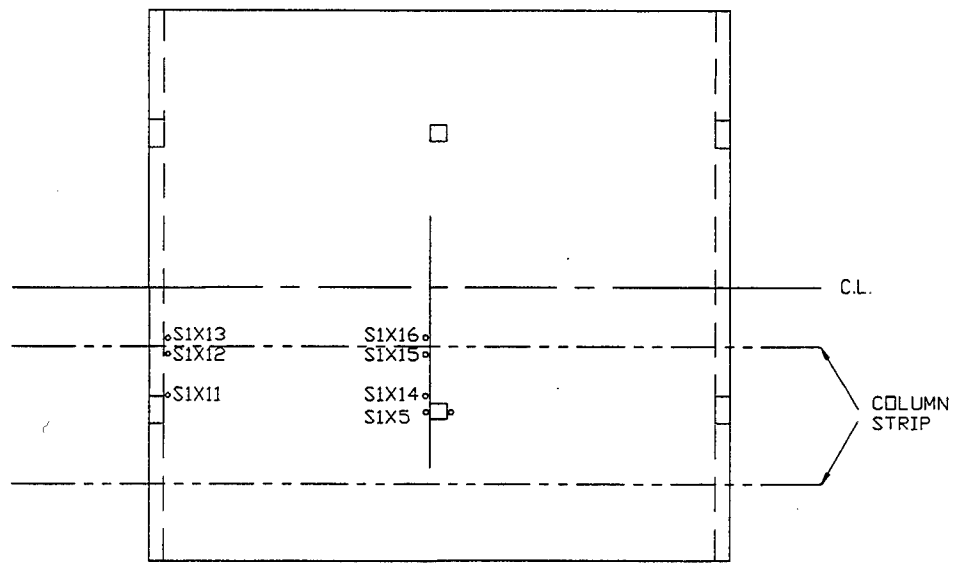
Active Reinforcement Strain Gages in First Floor Slab
